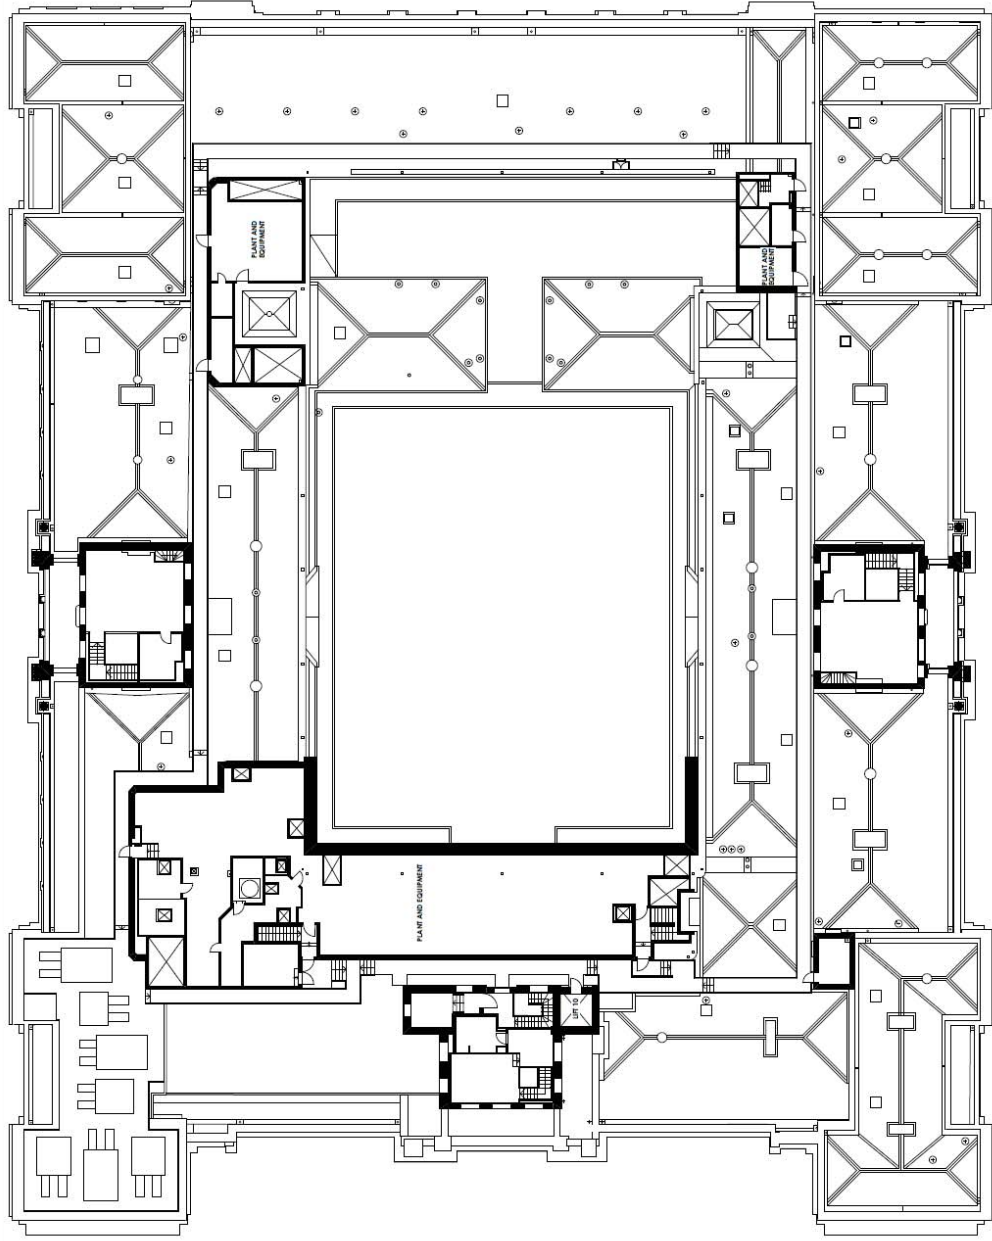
Floor Plan, Level 4 (ML Design 2016)
